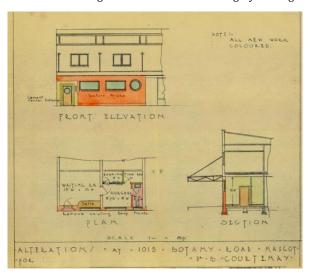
DA approval drawing of No. 1015 and 1017 from circa 1949, showing that existing front façade and internal layout has been altered
